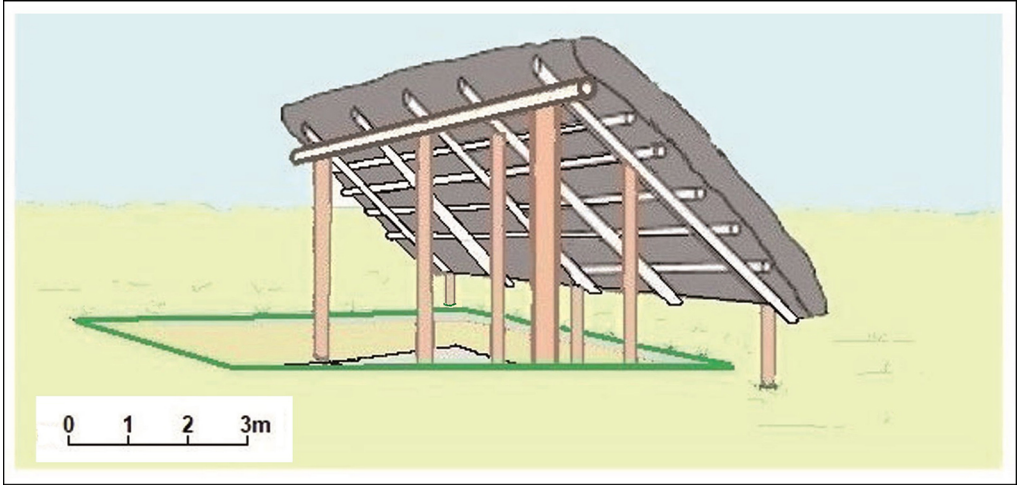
Illustration of a reconstruction of the sunken-floor-building, constructed from eight postholes, at Dauerthal (figure by author).
